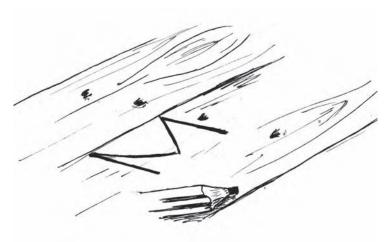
}\,$ Pencil markings on the floor to indicate the position of the bottom of a timber framed wall
